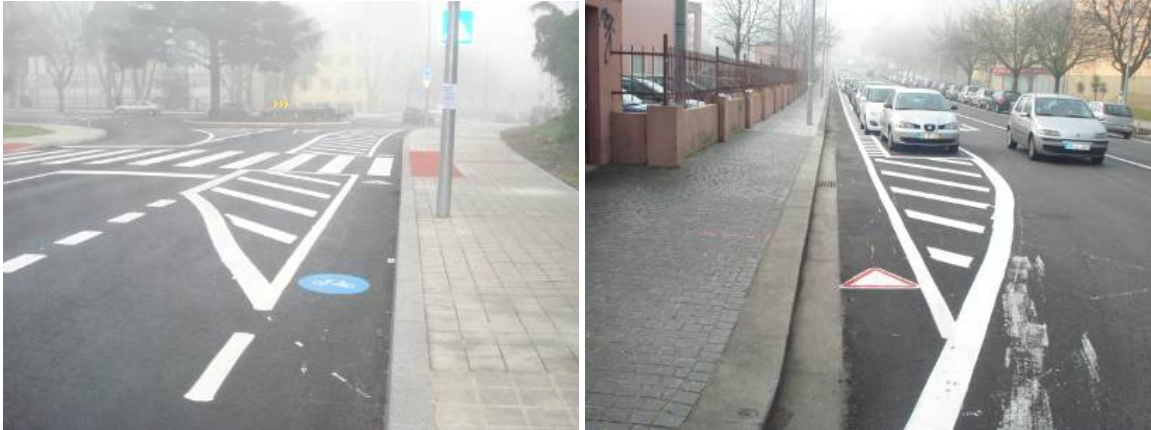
Roundabout on Dr. António Bernardino de Almeida street with Conde d'Avranches street intersection (after signalization)
